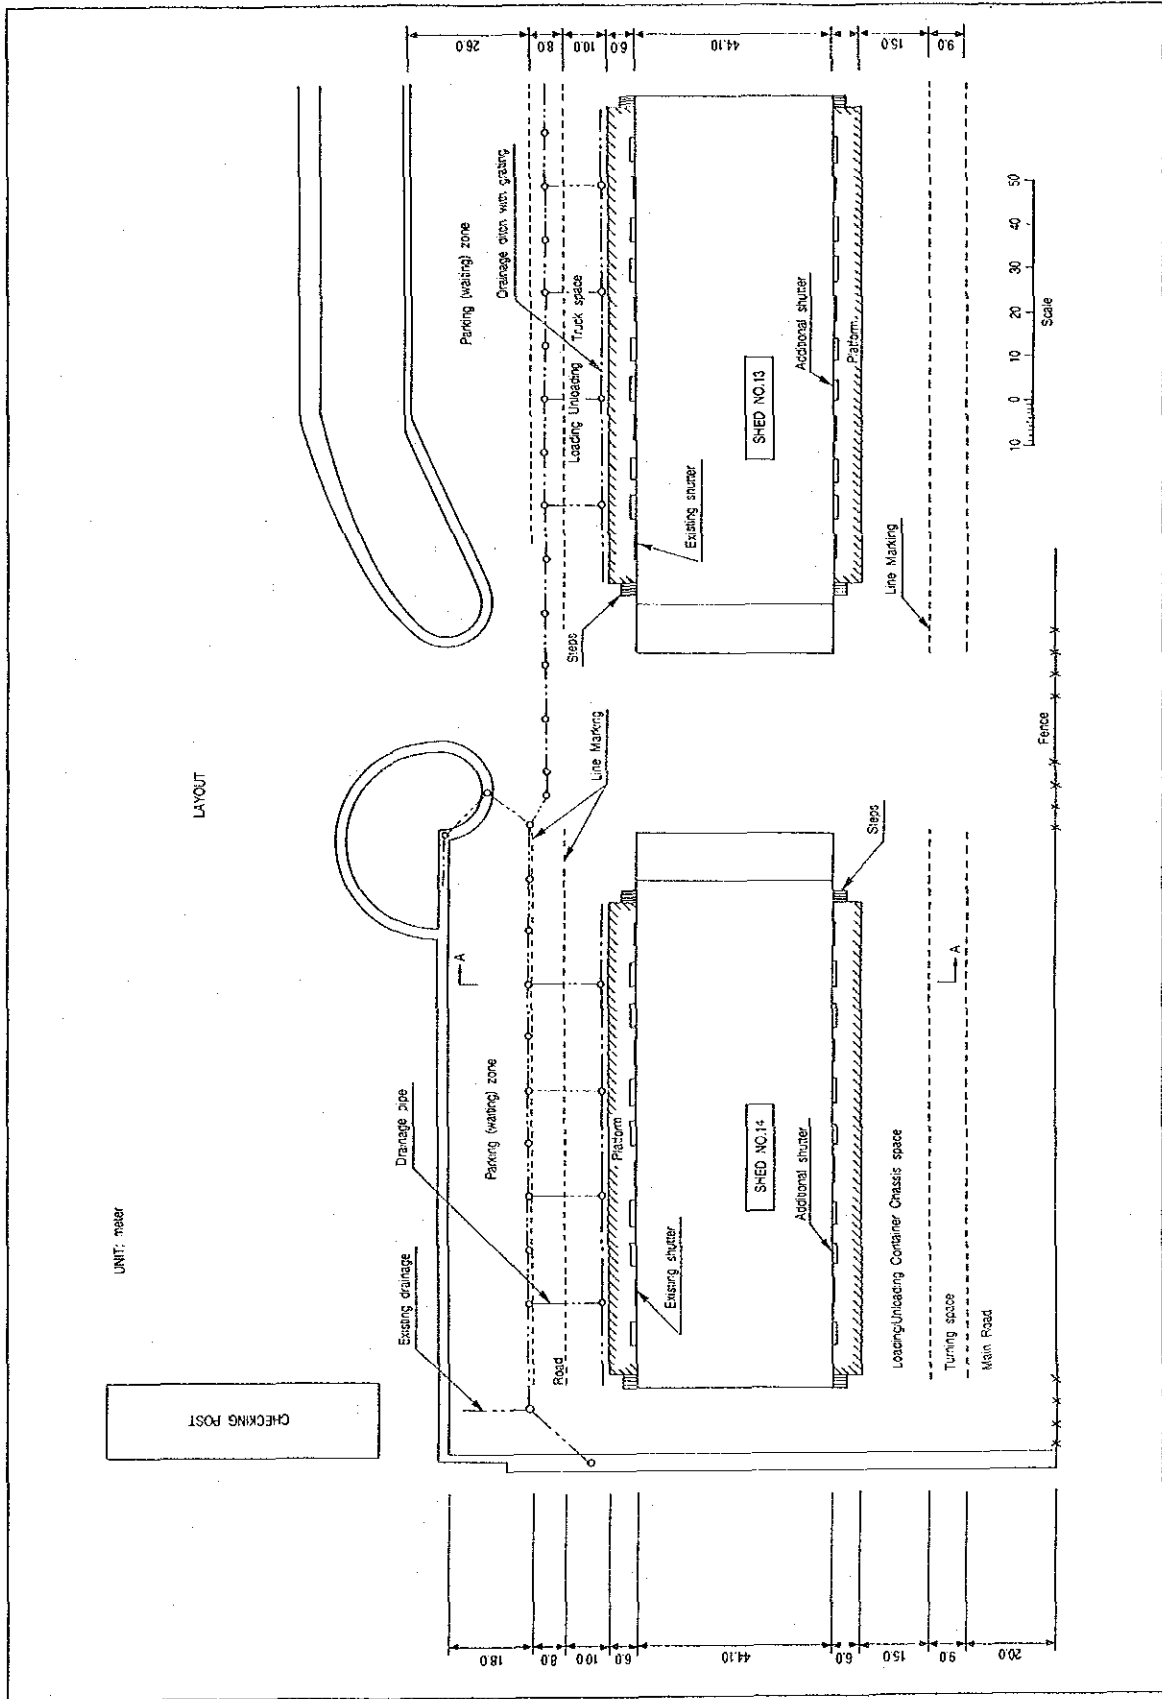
Modification Plan of Transit Shed No.13, 14
